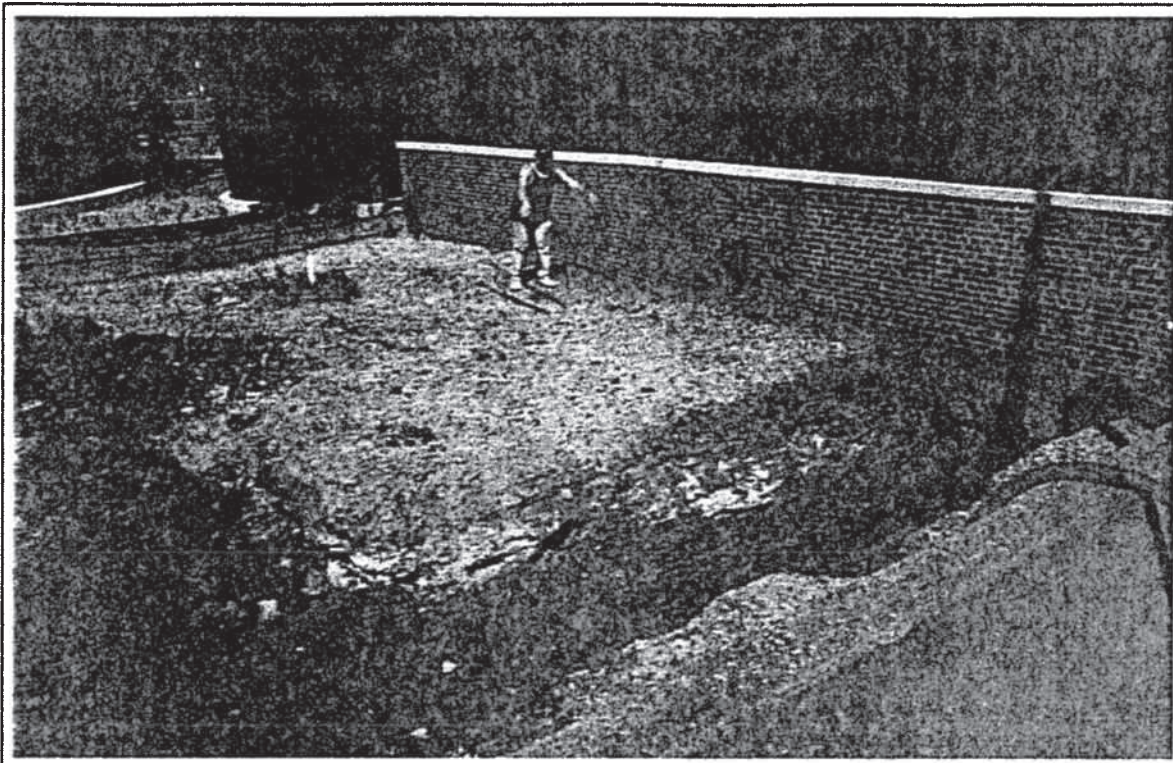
Looking southeast at placement of stone in spill containment pad area.
